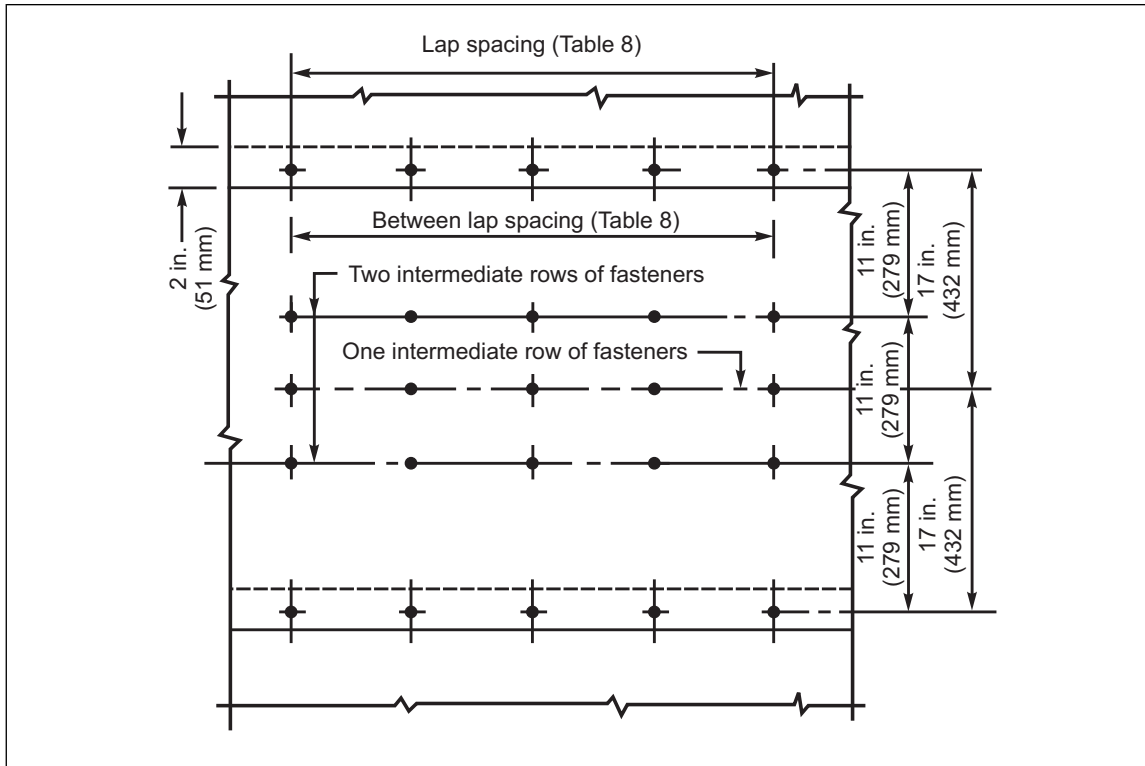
Fastener layout for 36 in. (914 mm) wide base sheet
